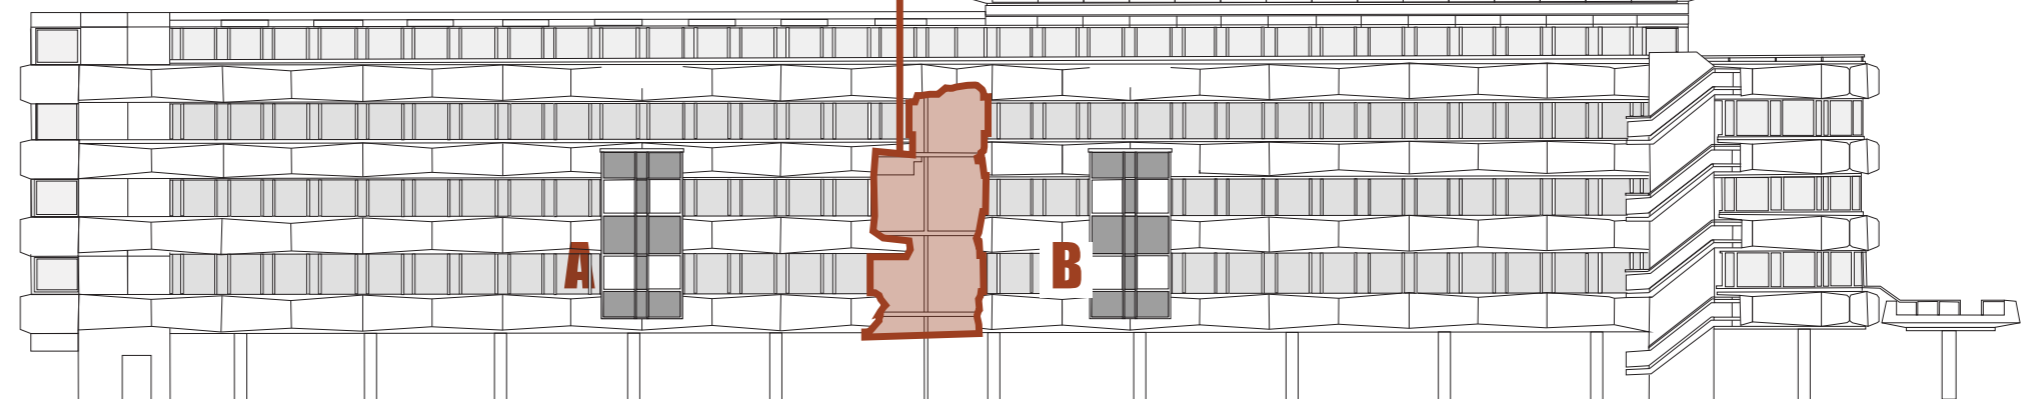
EXPOSED AND DAMAGED PREFAB ELEMENT AND FLOOR SLABS AT THE DAMAGED LOCATION
